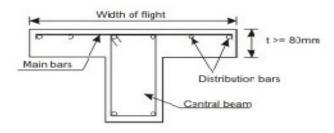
(c): Doubly cantilever slab from a central beam
